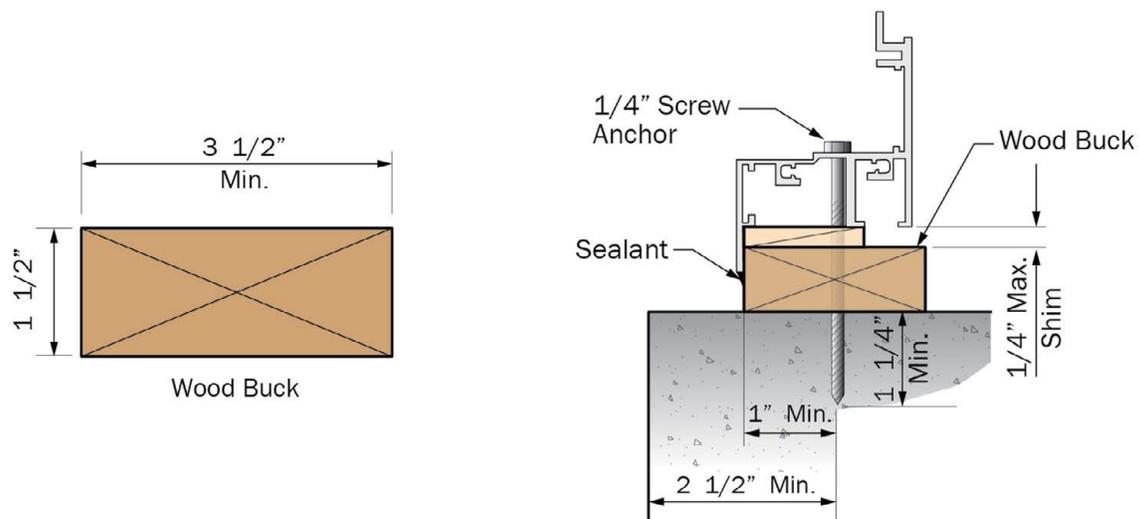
Use screw anchors to fasten window frames directly to concrete.
